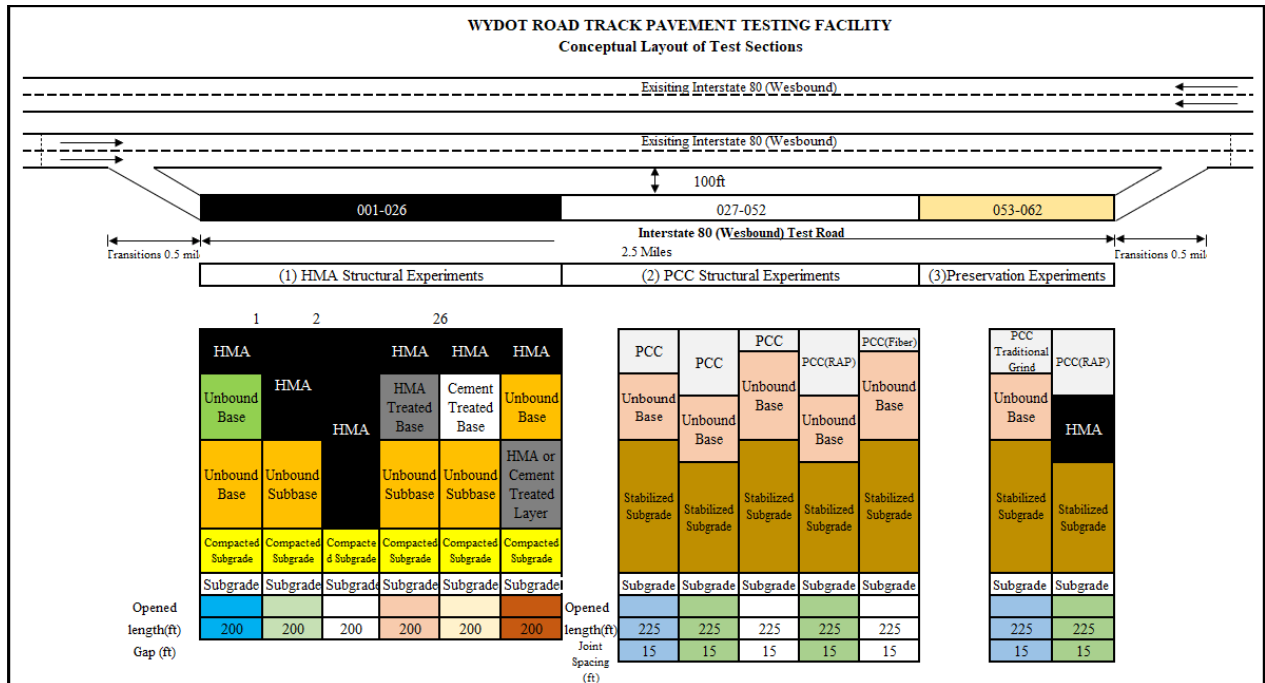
The conceptual layout of the testing sections on the mainline of I-80.
